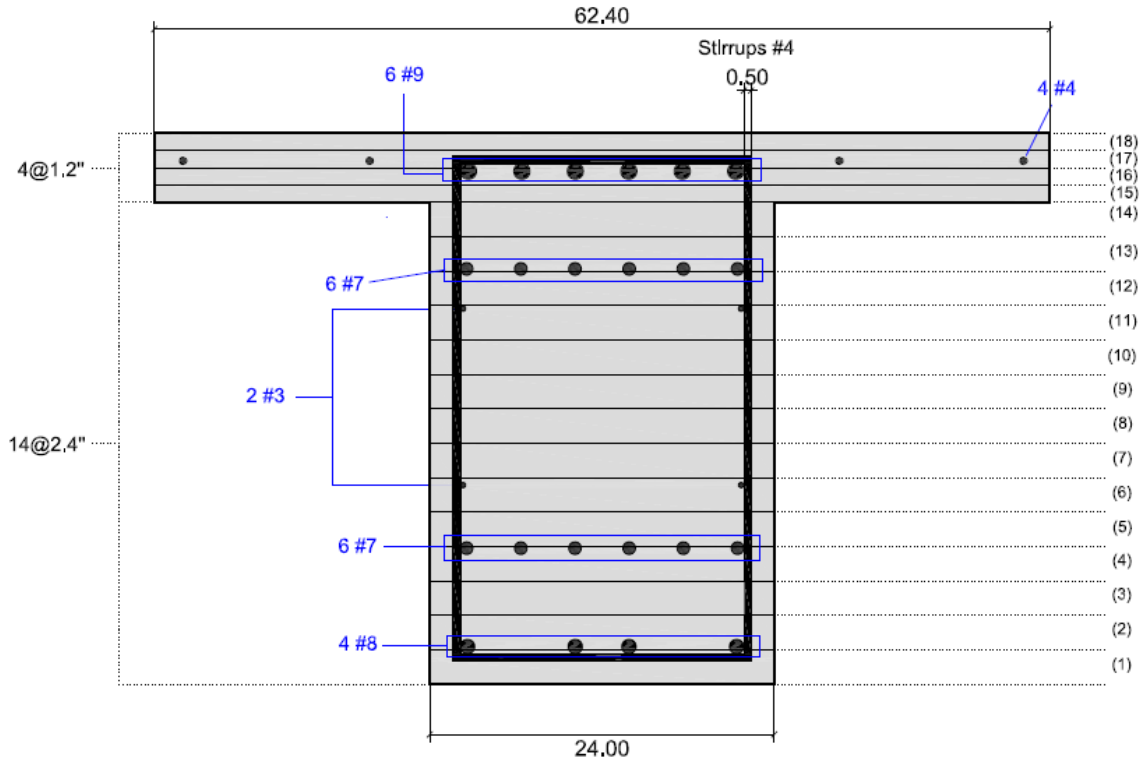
Cross section 3 for Specimen 6. Dimensions in inches.
